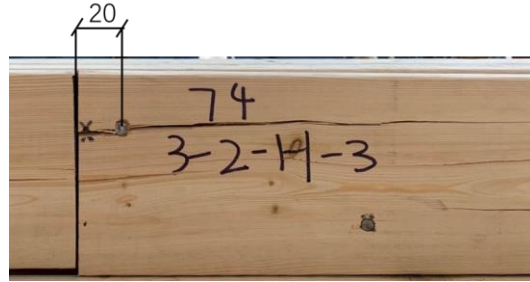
Splitting failure occurring at a butt joint in specimen 3-2-H
